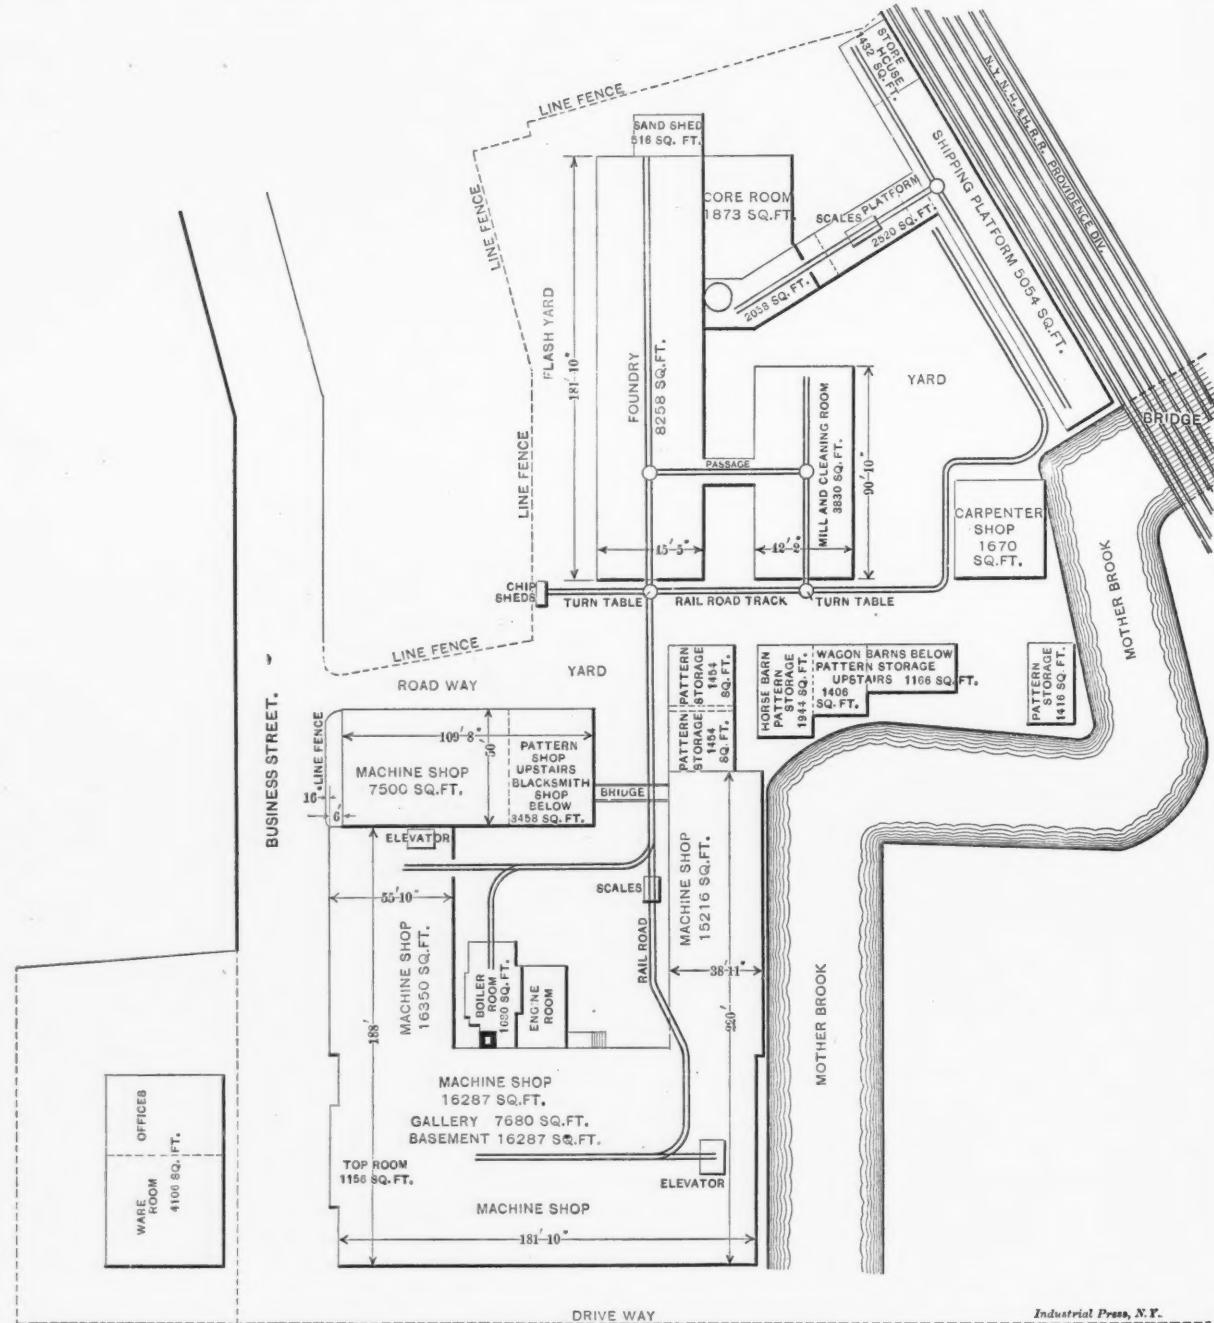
Ground Plan of the Works of the Becker-Brainard Milling Machine Co.
